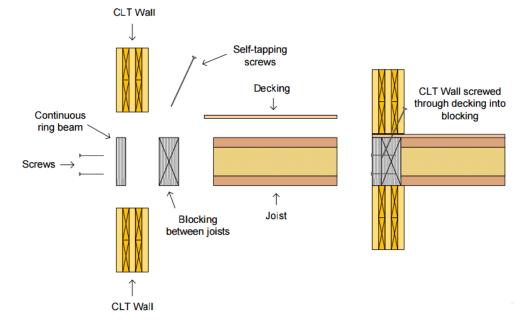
CLT wall and i-joisted floor with EWP rim board and blocking. (Adapted from Mohammad 2011)
